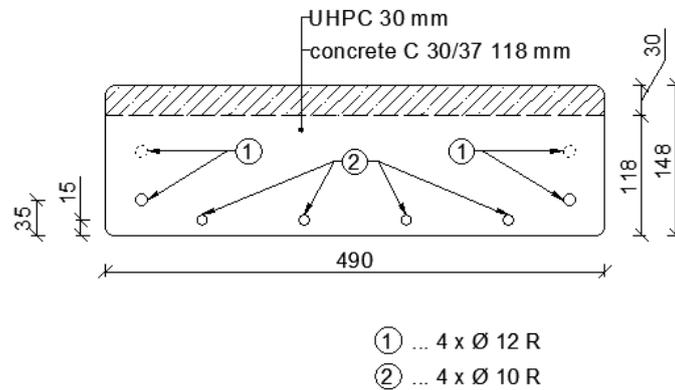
Typical geometry of the strengthened panels after the UHPC layer application [14].
